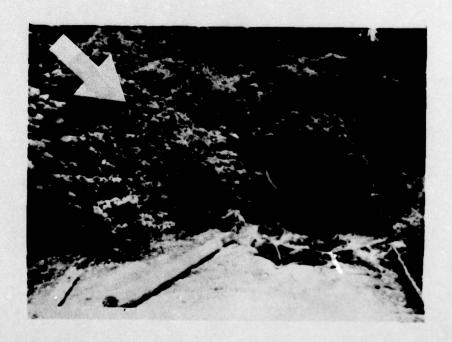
PRINCIPAL SPILLWAY OUTLET, SECONDARY SPILLWAY OUTLET OBSCURED-LOCATION NOTED BY ARROW
